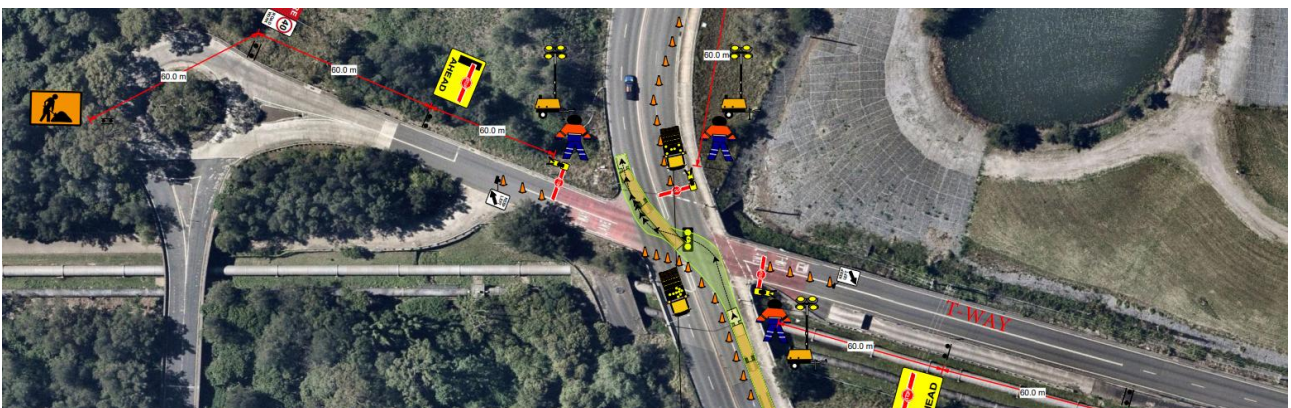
Proposed temporary traffic layout at the intersection of T-Way and Widemere Road (crossing the median island).
